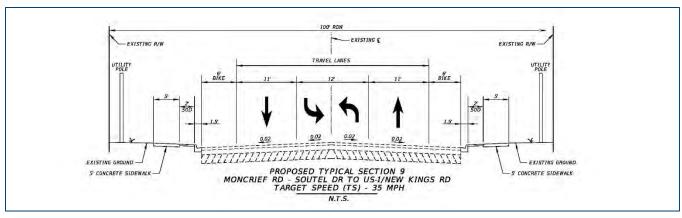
Proposed Typical Section (Soutel Drive to US 1/New Kings Road)
